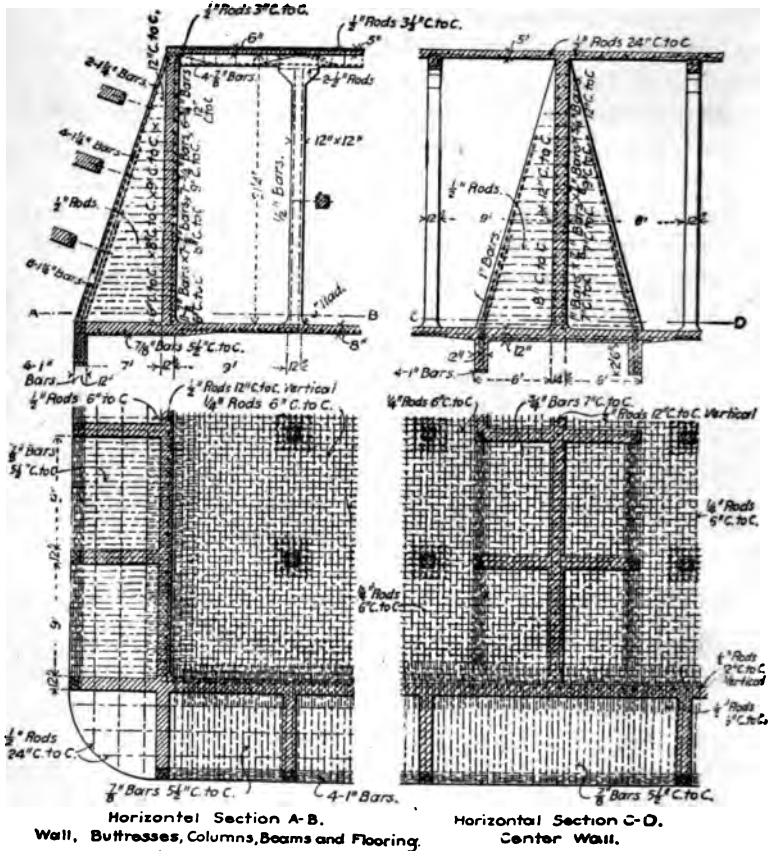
Details of Walls and Buttress, East Orange Reservoir.
